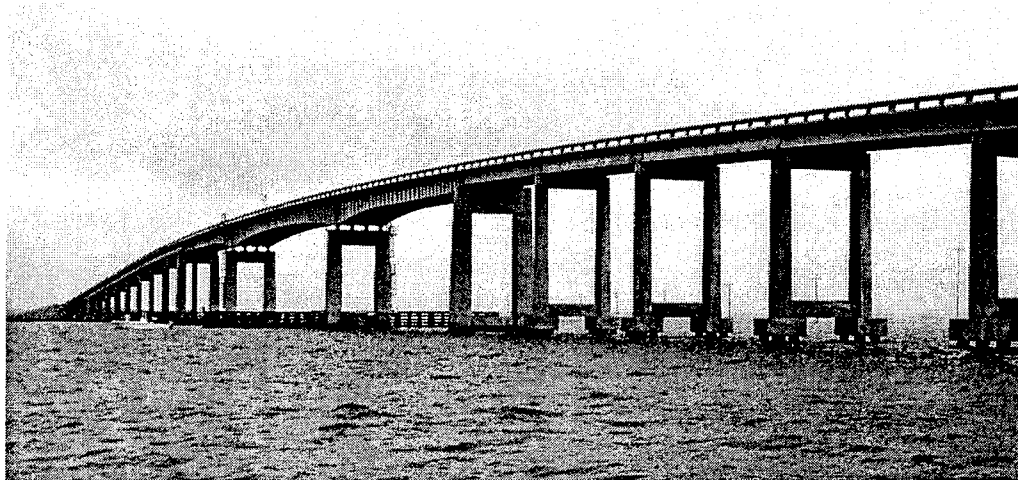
Southern section of the St. George Island causeway bridge (view is looking north with barrier island shown at left edge of image)
